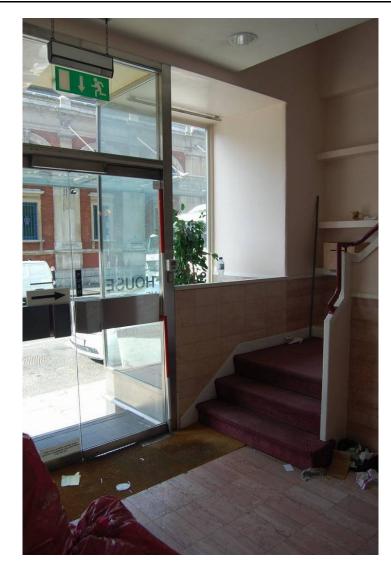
20-23 Long Lane and 22 Lindsey Street, stair detail
